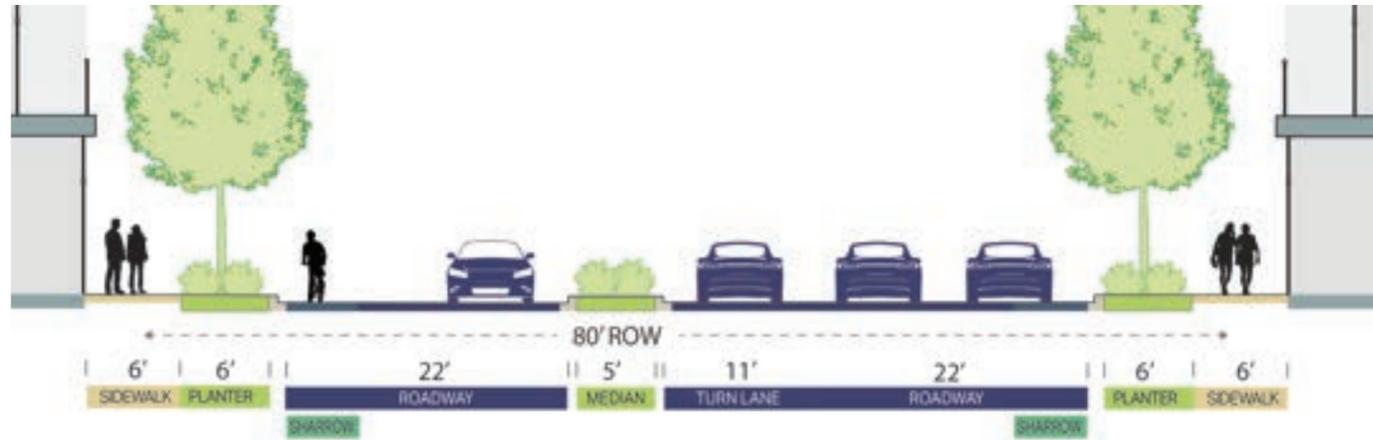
Imagery depicting typical cross sections of connecting major streets
